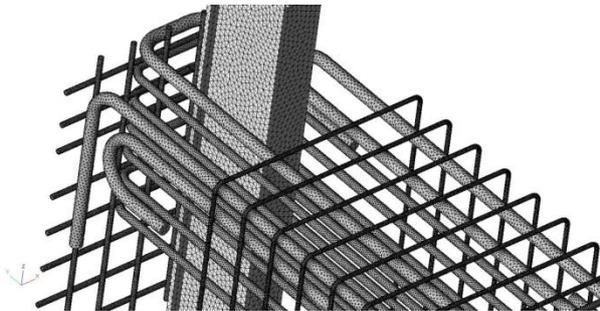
Analytical model of reinforcements and girder. Figure 4.4. Analytical model of concrete and girder
